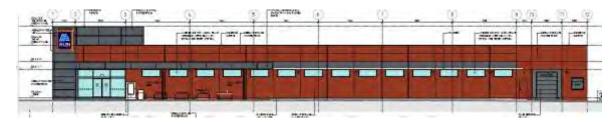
Southern Elevation – Design of Façade and Entry Points (BuiltConsult Pty Ltd.)
